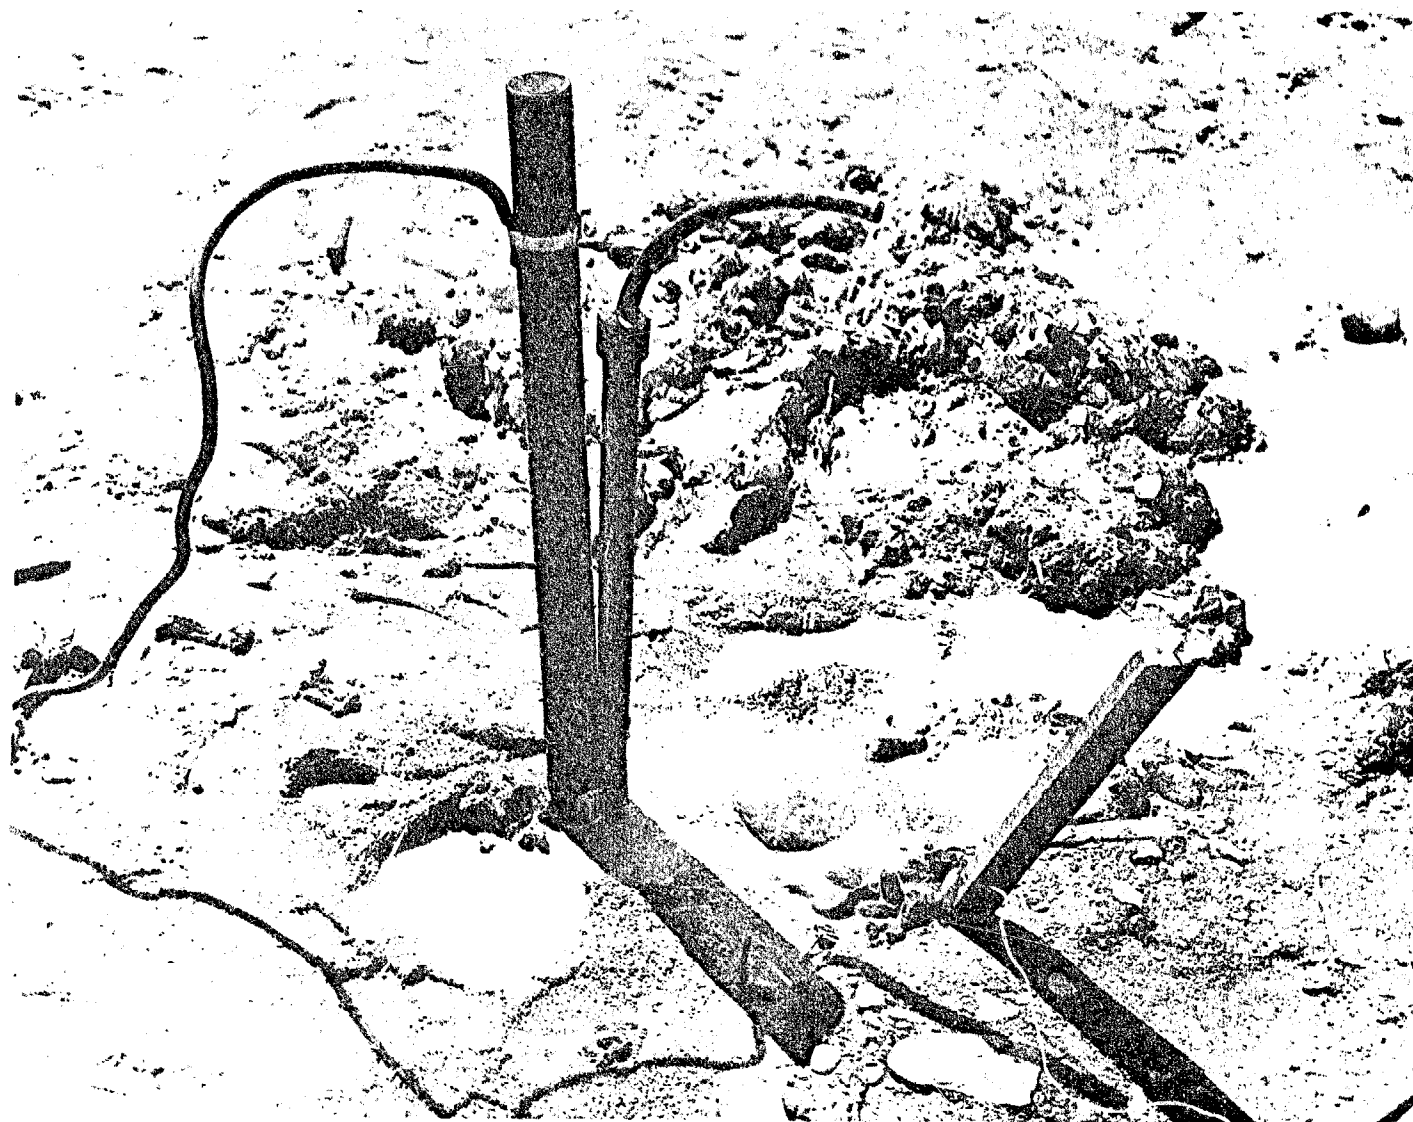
DRAINAGE FROM CATHODIC PIPE AT BIG PIC RIVER BRIDGE, MARATHON, ONTARIO
